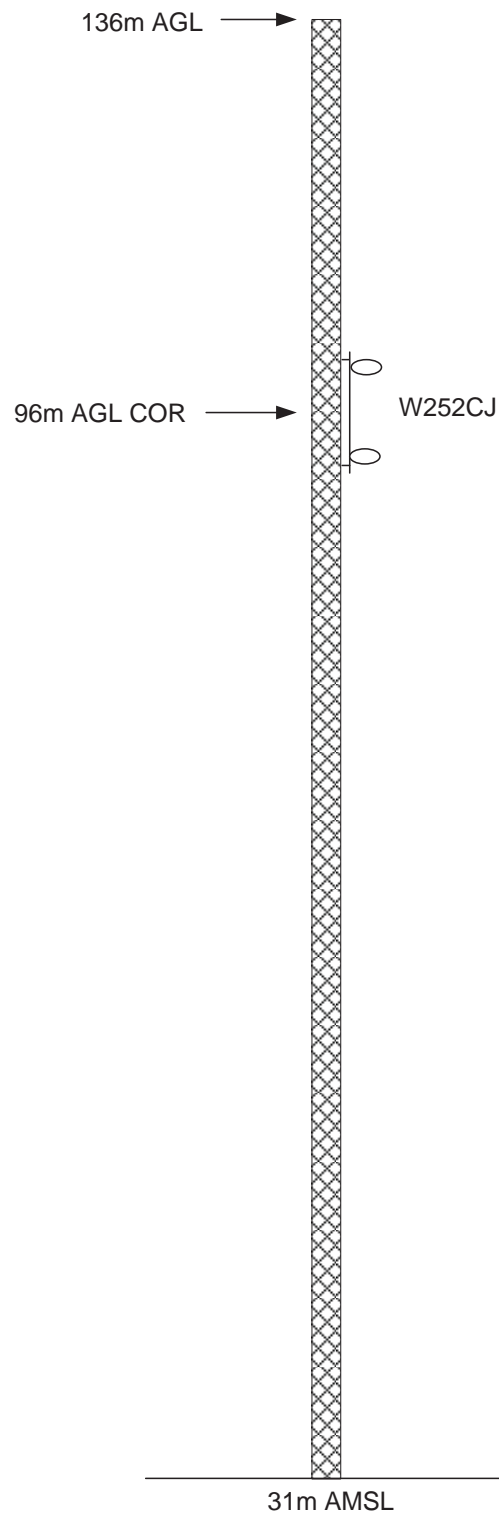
Elevation Sketch of WCAT Tower #1
